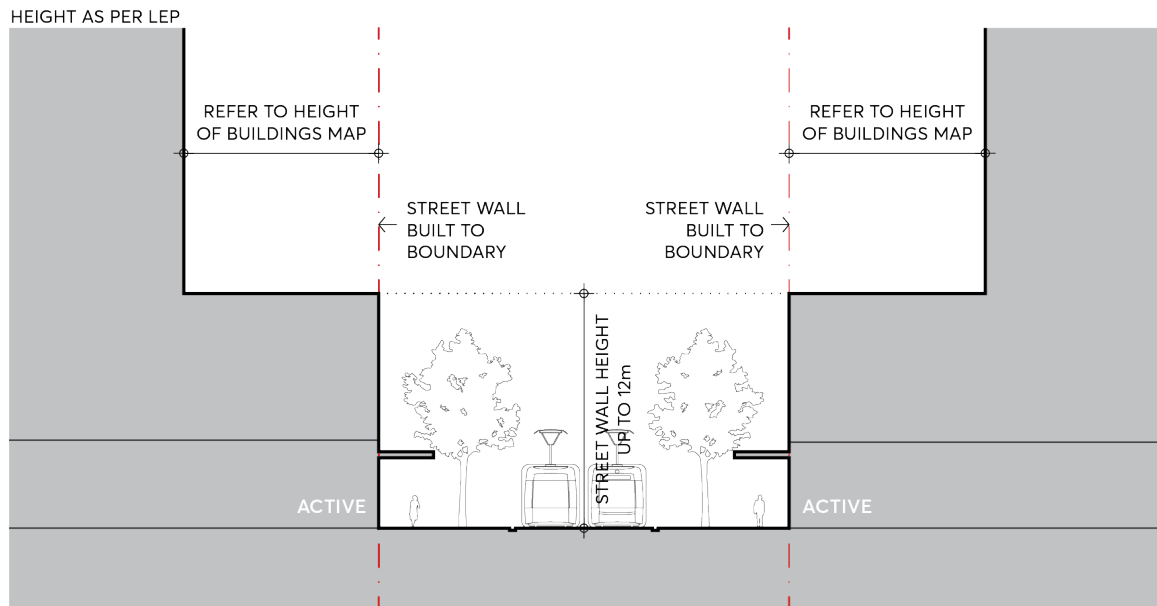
Church Street - Street Setbacks and Street Wall Height
